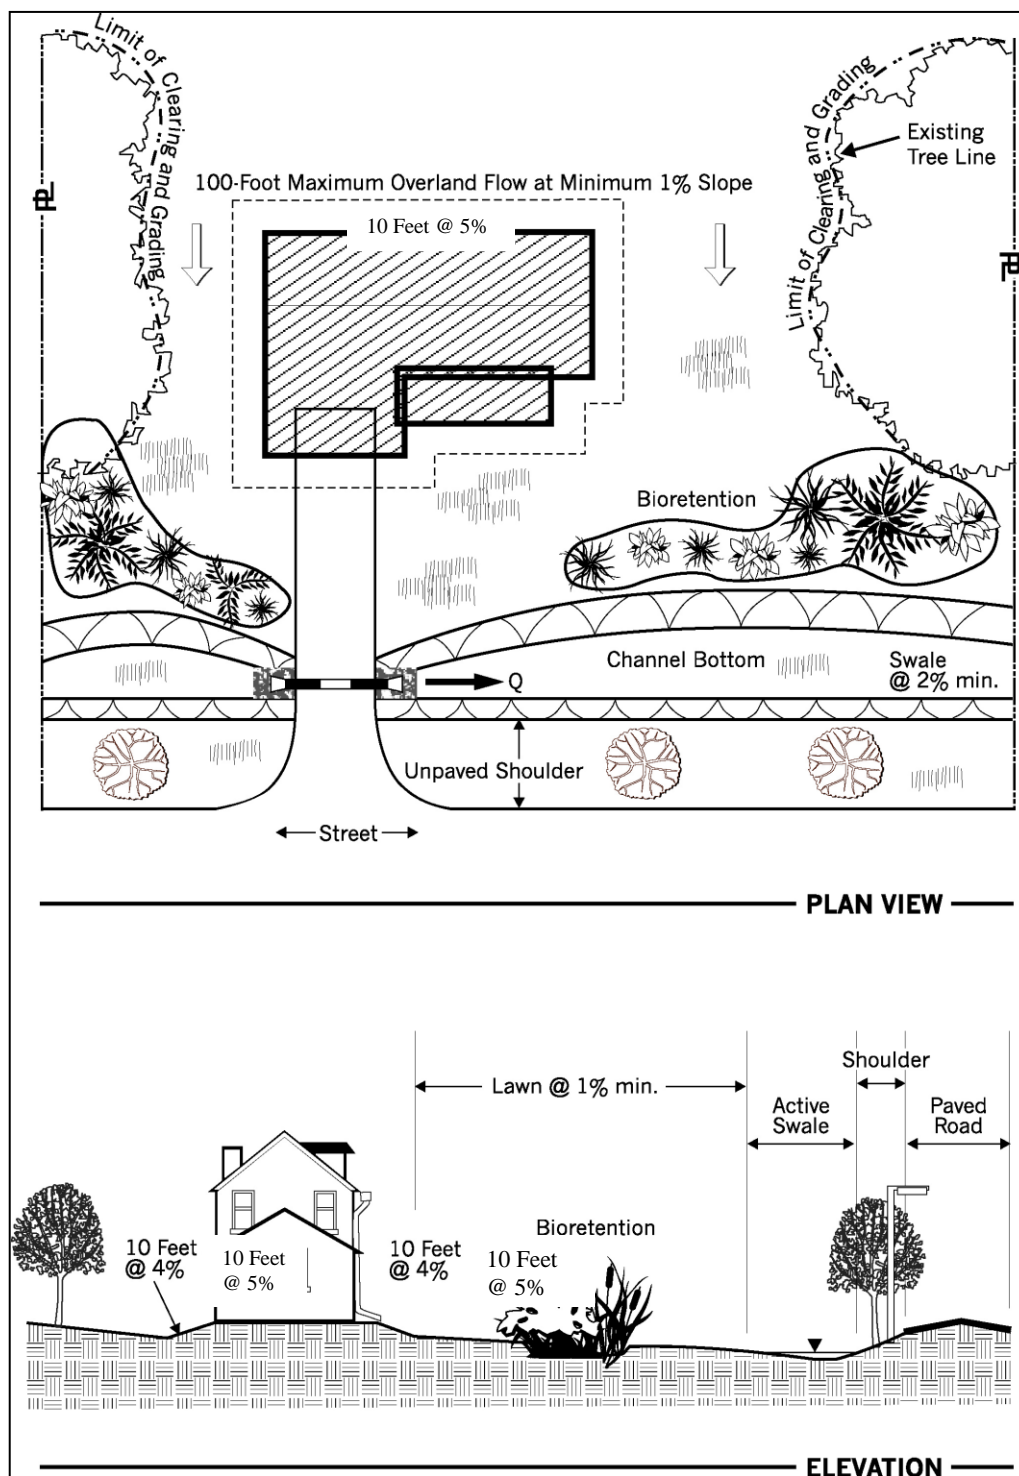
Schematic of Residential Single-Family Low Impact Lot Layout
